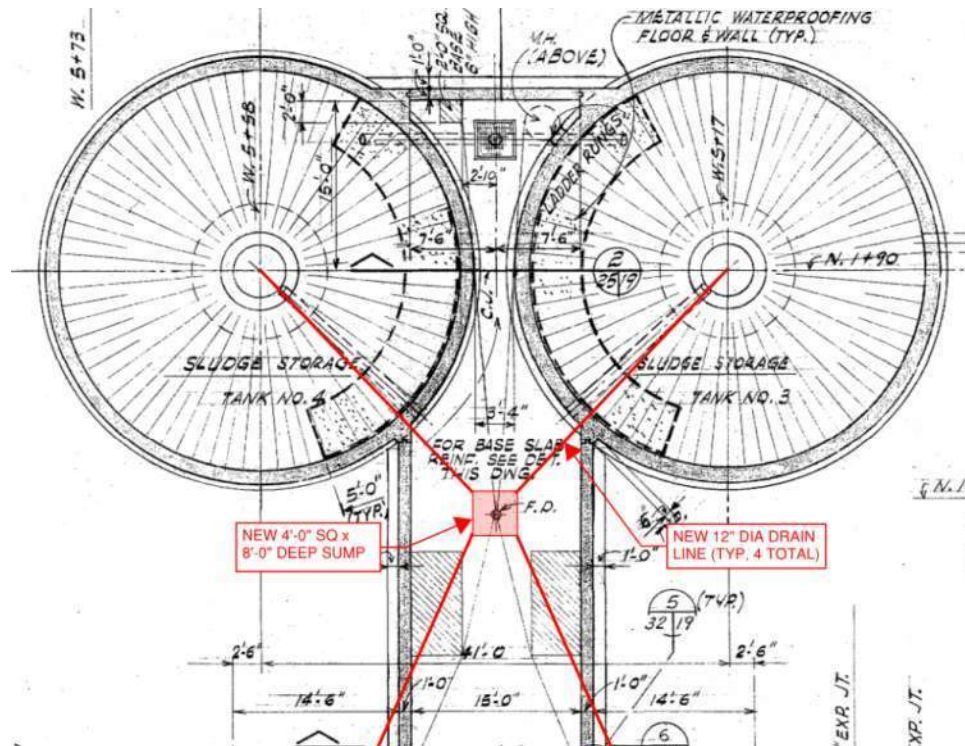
Alt-A3 - Tank Drainage Sump Located in SSTs 1-4 Pipe Gallery
